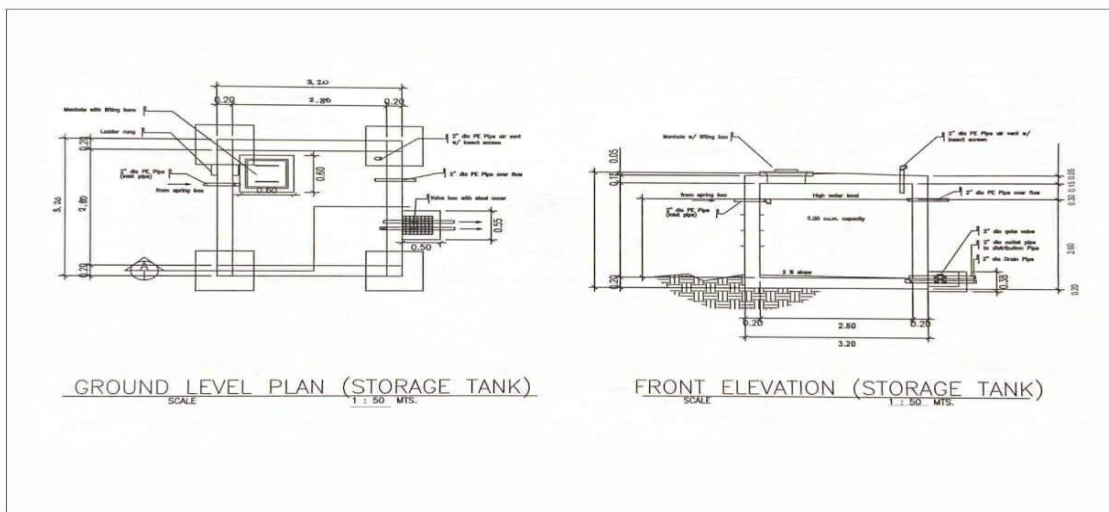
Foundation Plan and Section View of the SWIS Storage Tank
